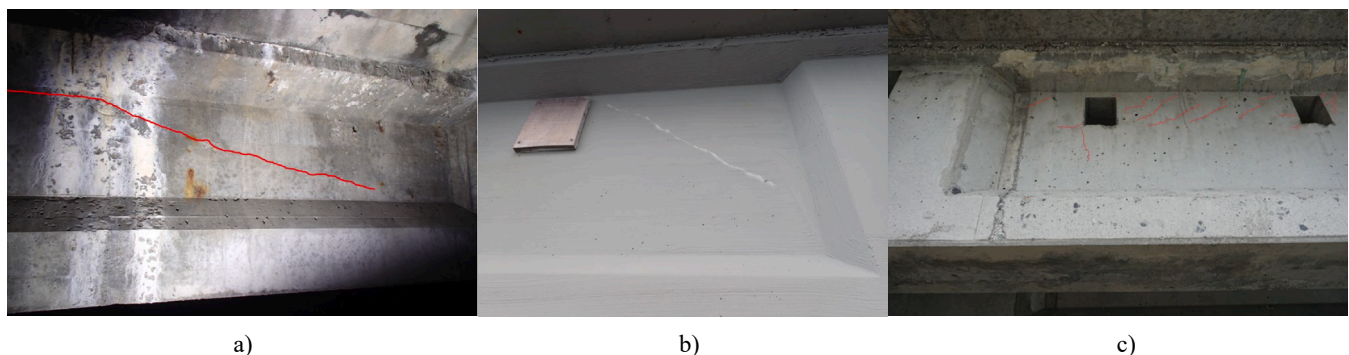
Structural damage in pretensioned I-shaped bridge girders. a) Diagonal shear crack (marked in red); b) Diagonal shear crack with calcium carbonate precipitation, photo from NPRA [7]; c) Hairline diagonal cracks (marked with red) propagating from the interface between top flange and web. (For interpretation of the references to colour in this figure legend, the reader is referred to the web version of this article.)
